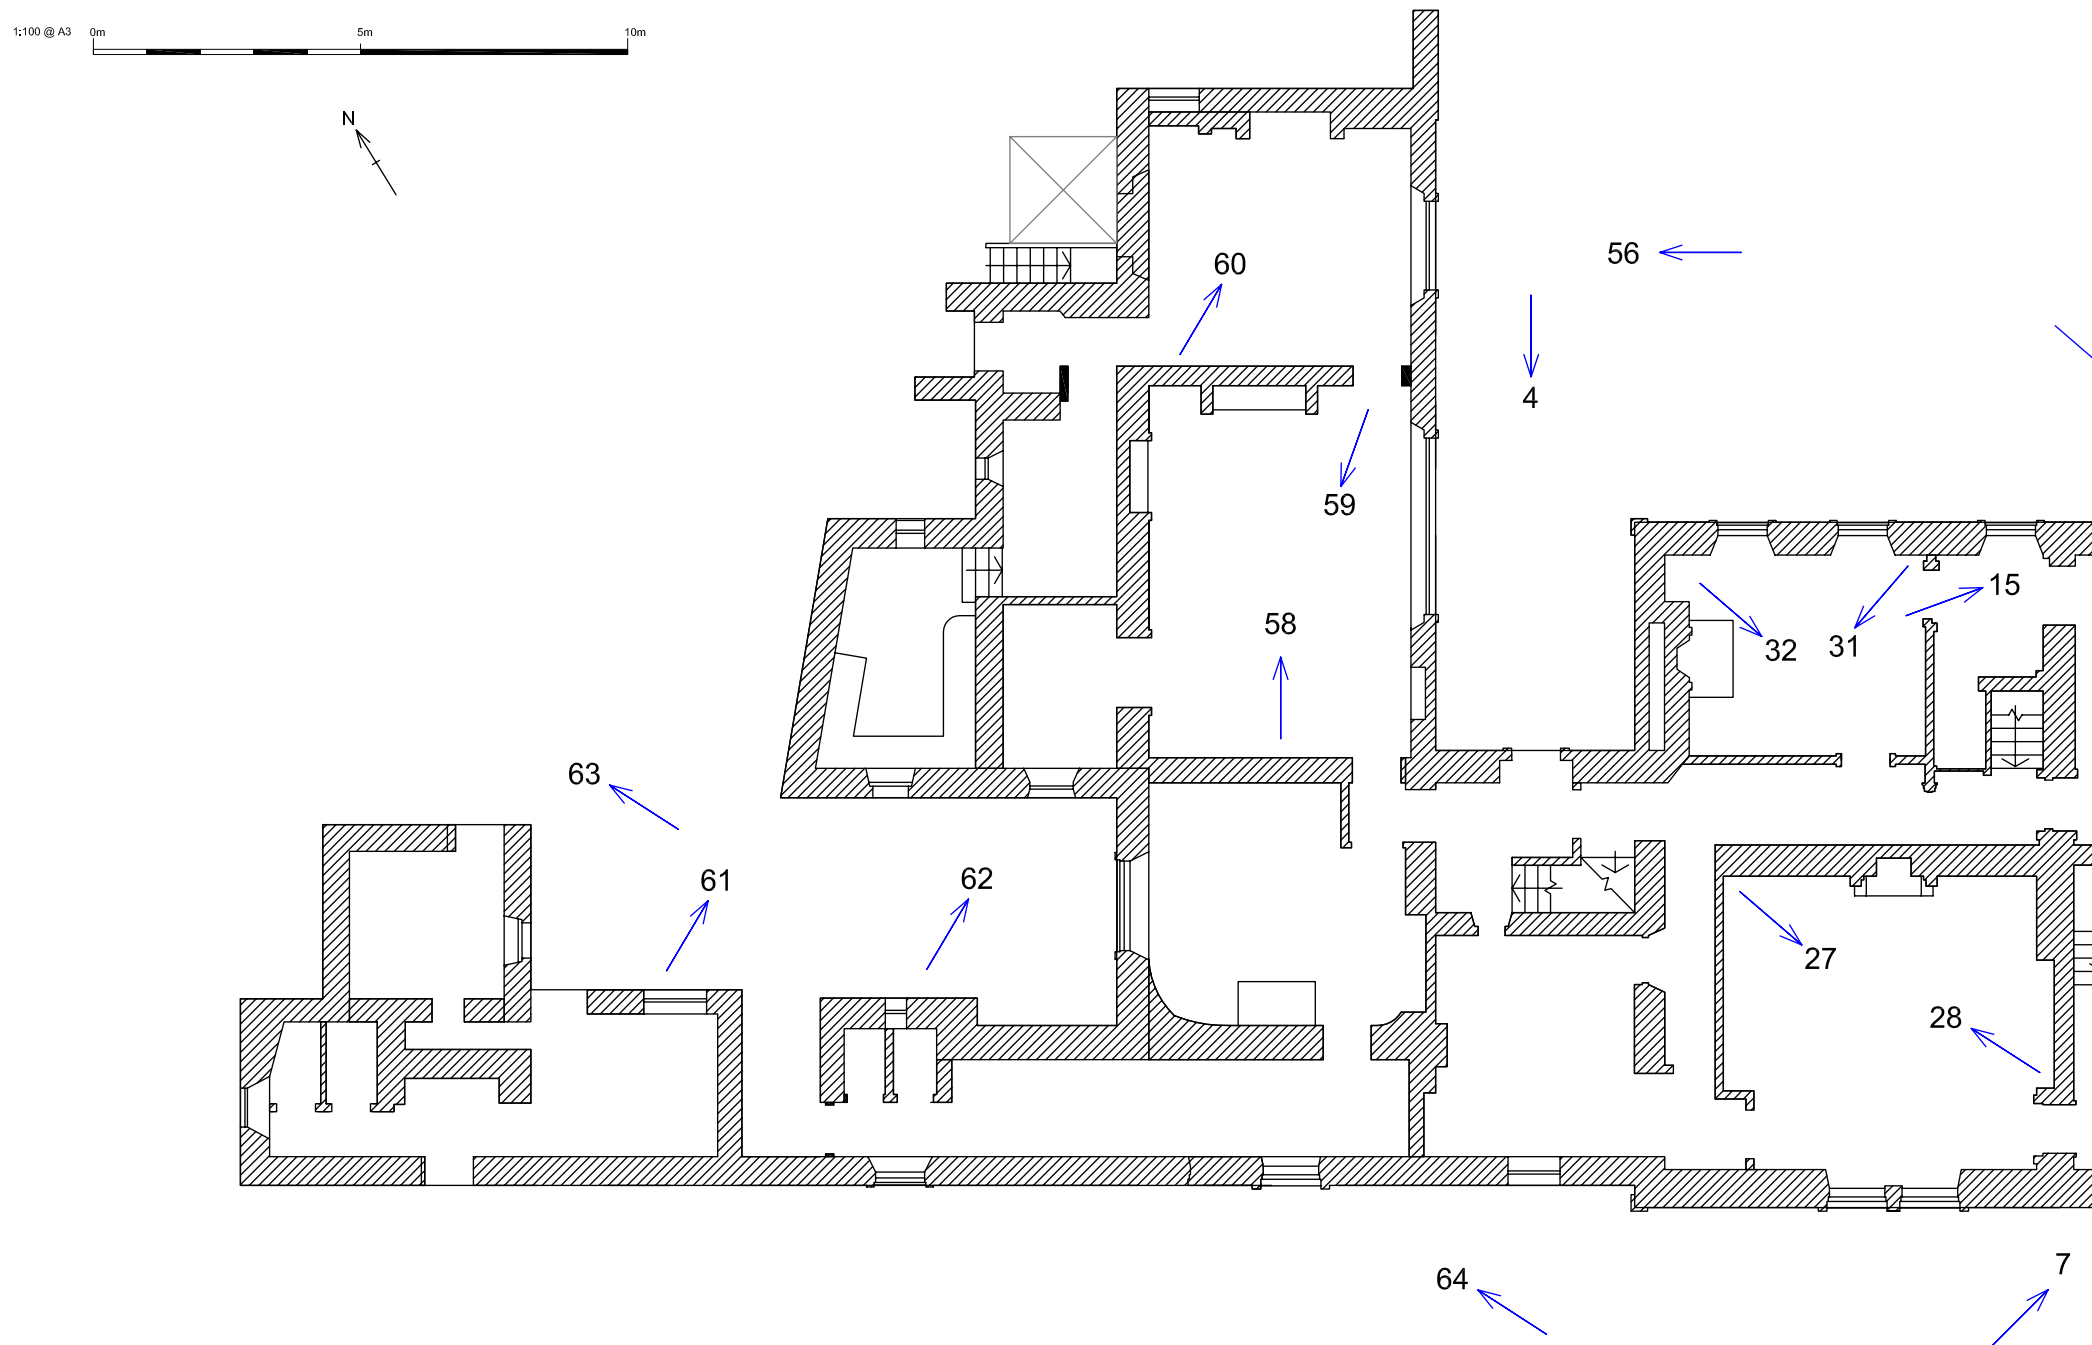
Photograph Location Plan: Ground Floor of Service Block
